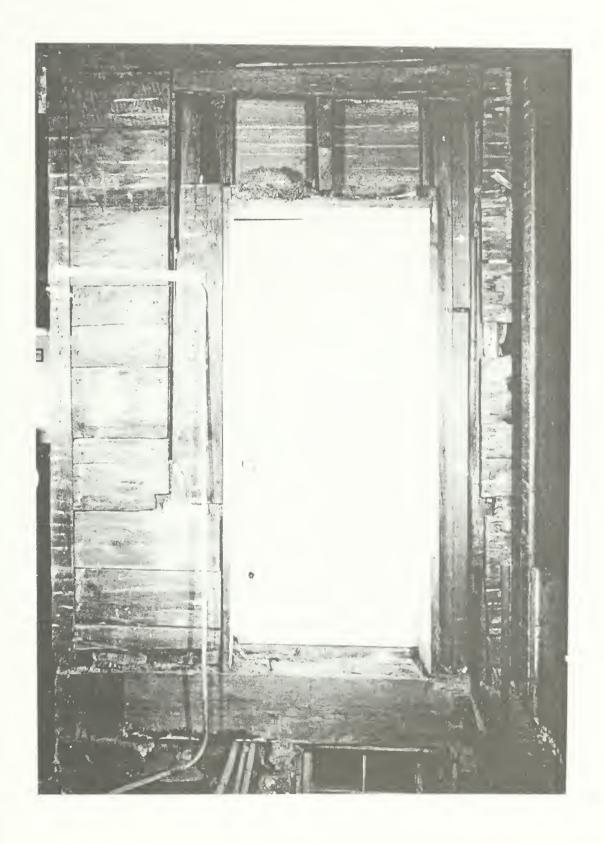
Schuyler House: View of north wall of main house from inside ca.-1815 pantry addition; evidence in framing of 1787 window converted to a doorway (November 1959).
